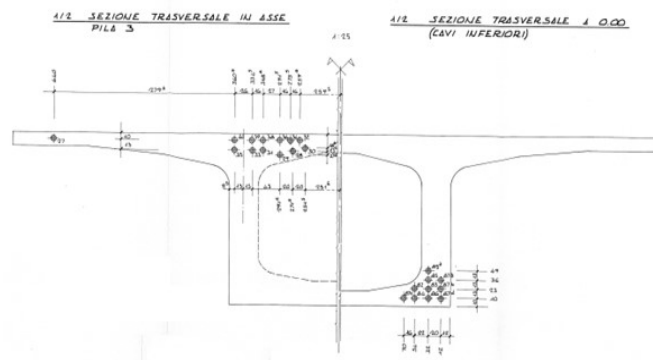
Cross-sectional view and arrangement of tendons between pier 3 and pier 4.
